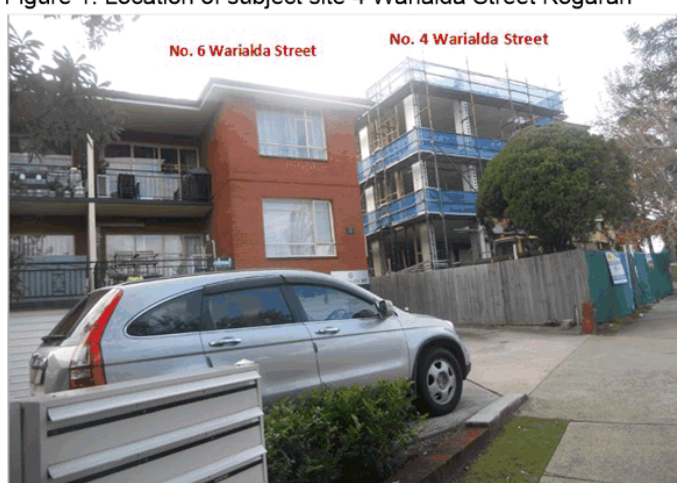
Subject site No. 4 Warialda Street Kogarah (right)
